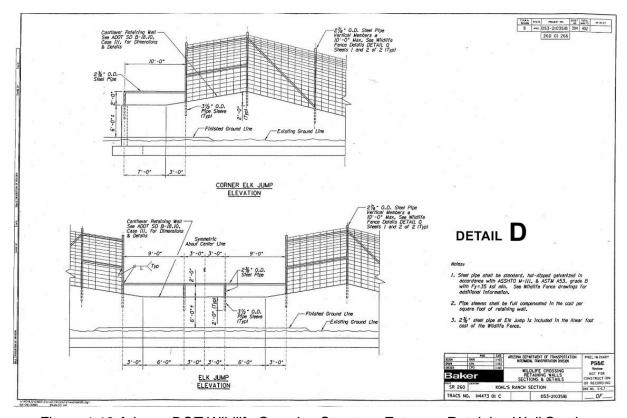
Arizona DOT Wildlife Crossing Structure Entrance Retaining Wall Section
